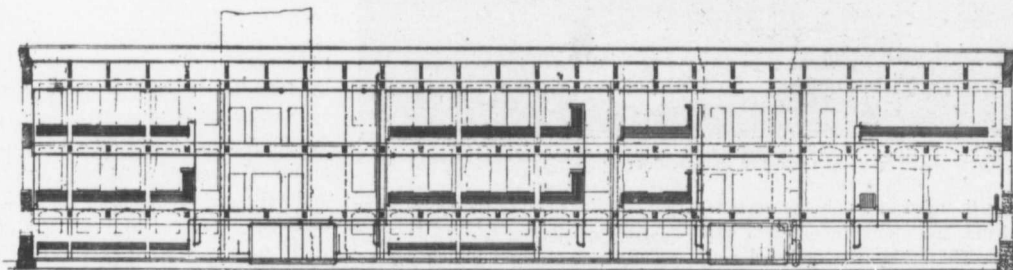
LONGITUDINAL SECTION OF MAIN BUILDING LOOKING NORTH.
